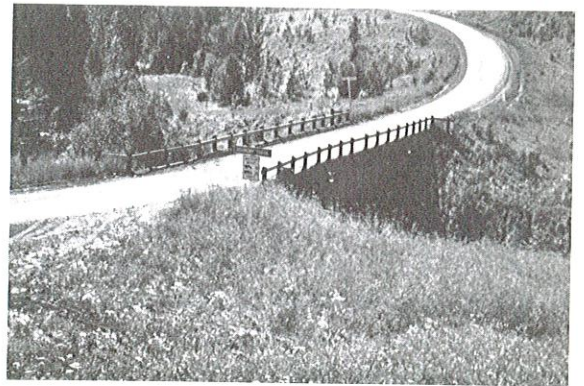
BRIDGE APPROACHES. Curved approaches onto a bridge will increase horizontal loading and may result in unexpected deterioration. Approaches should be constructed to allow vehicles to finish their turn before crossing a bridge.
